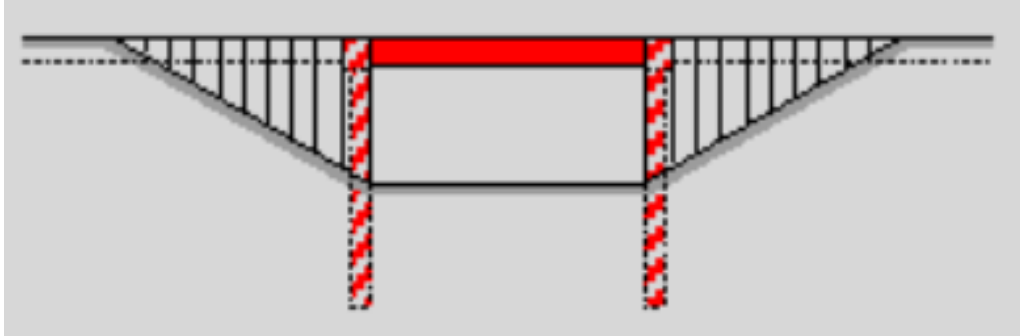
A single span bridge with wall-type abutments (LUSAS, 2014)
